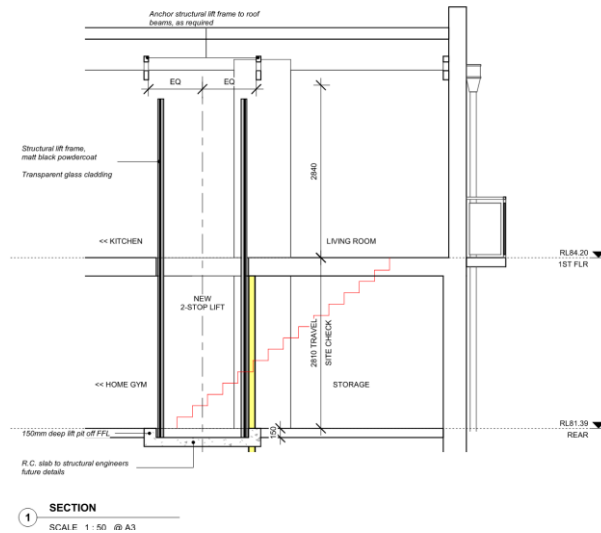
Proposed Section Plan (Source: HallGroup & Co)
